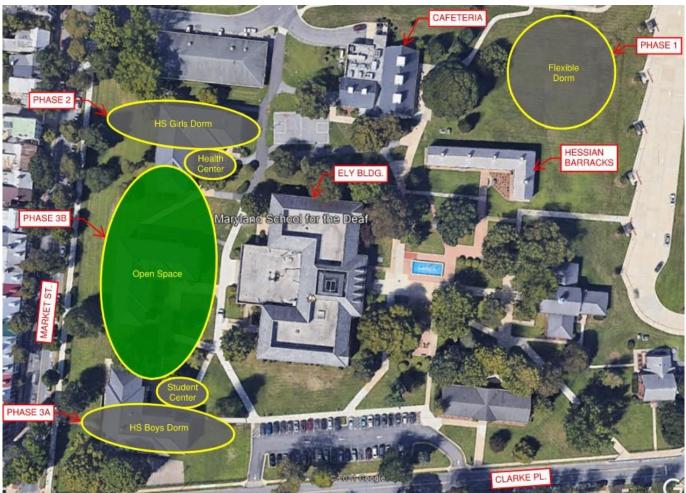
Maryland School for the Deaf proposed campus plan at completion of dormitory replacements.
